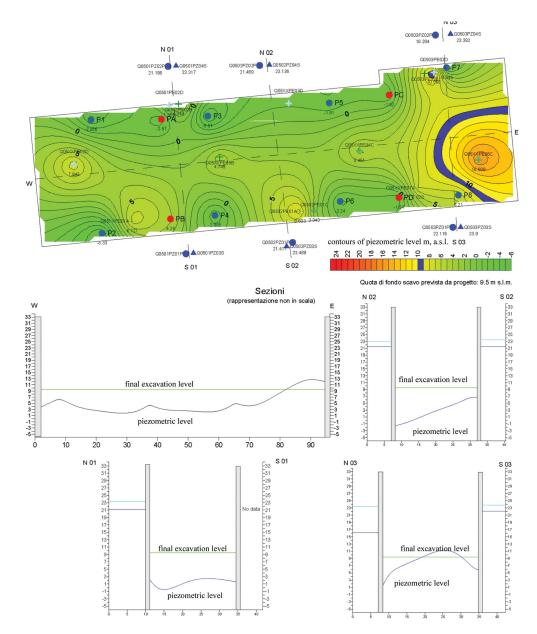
Lowering piezometric contours planning inside the TBM Malatesta Shaft and longitudinal/transversal dewatering sections during the test (IMG, 2008).
